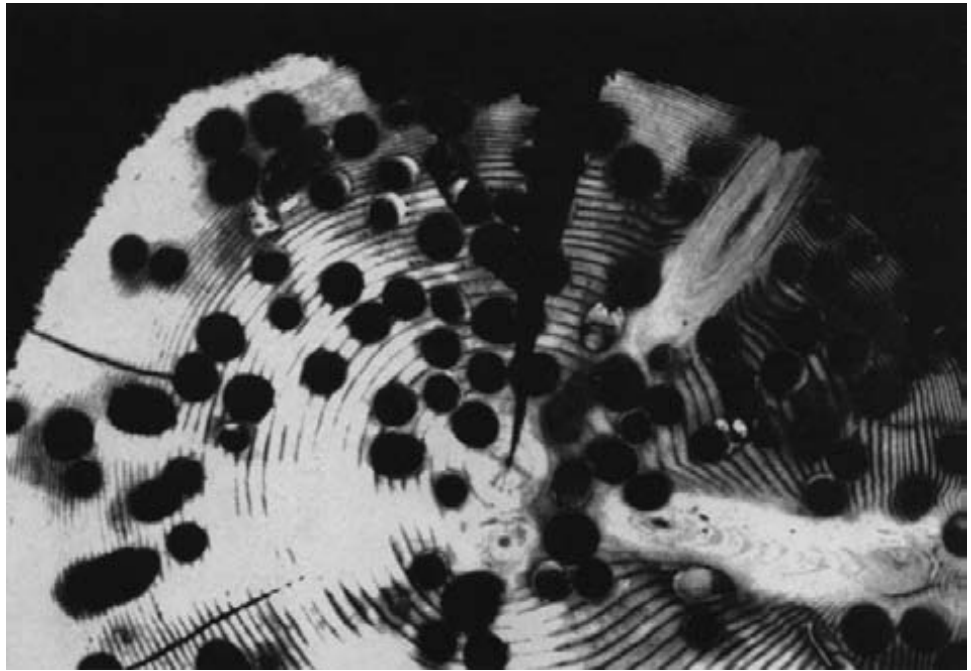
Internal wood damage caused by ship worms. Tunnels extend throughout the cross section and are usually covered with white calcium deposits.
